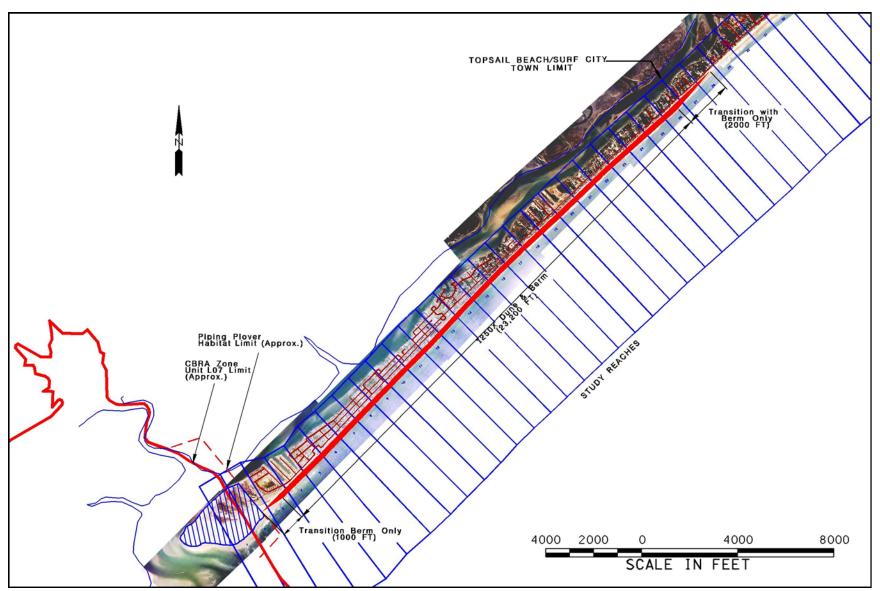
Plan 1250X, Locally Preferred Plan, Plan View
